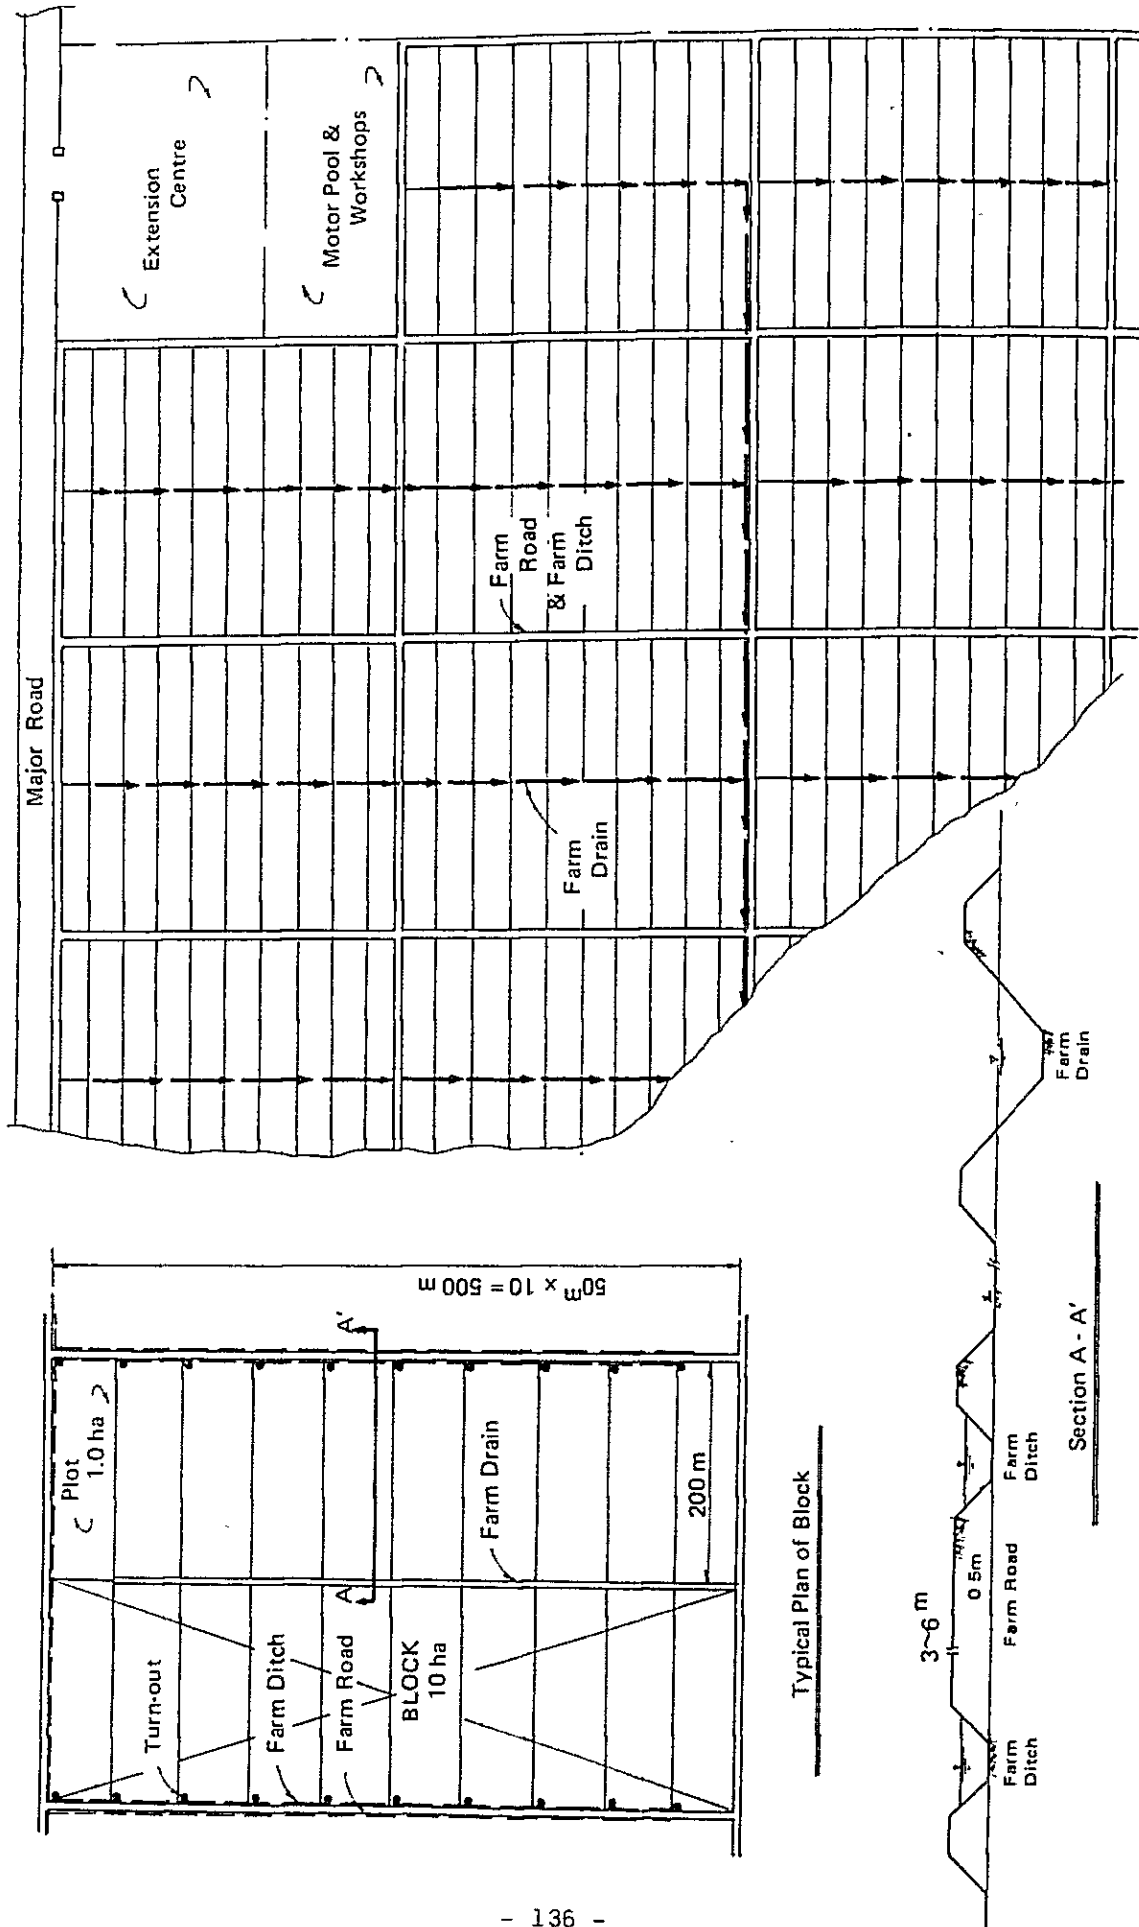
TYPICAL LAYOUT OF LAND CONSOLIDATION
